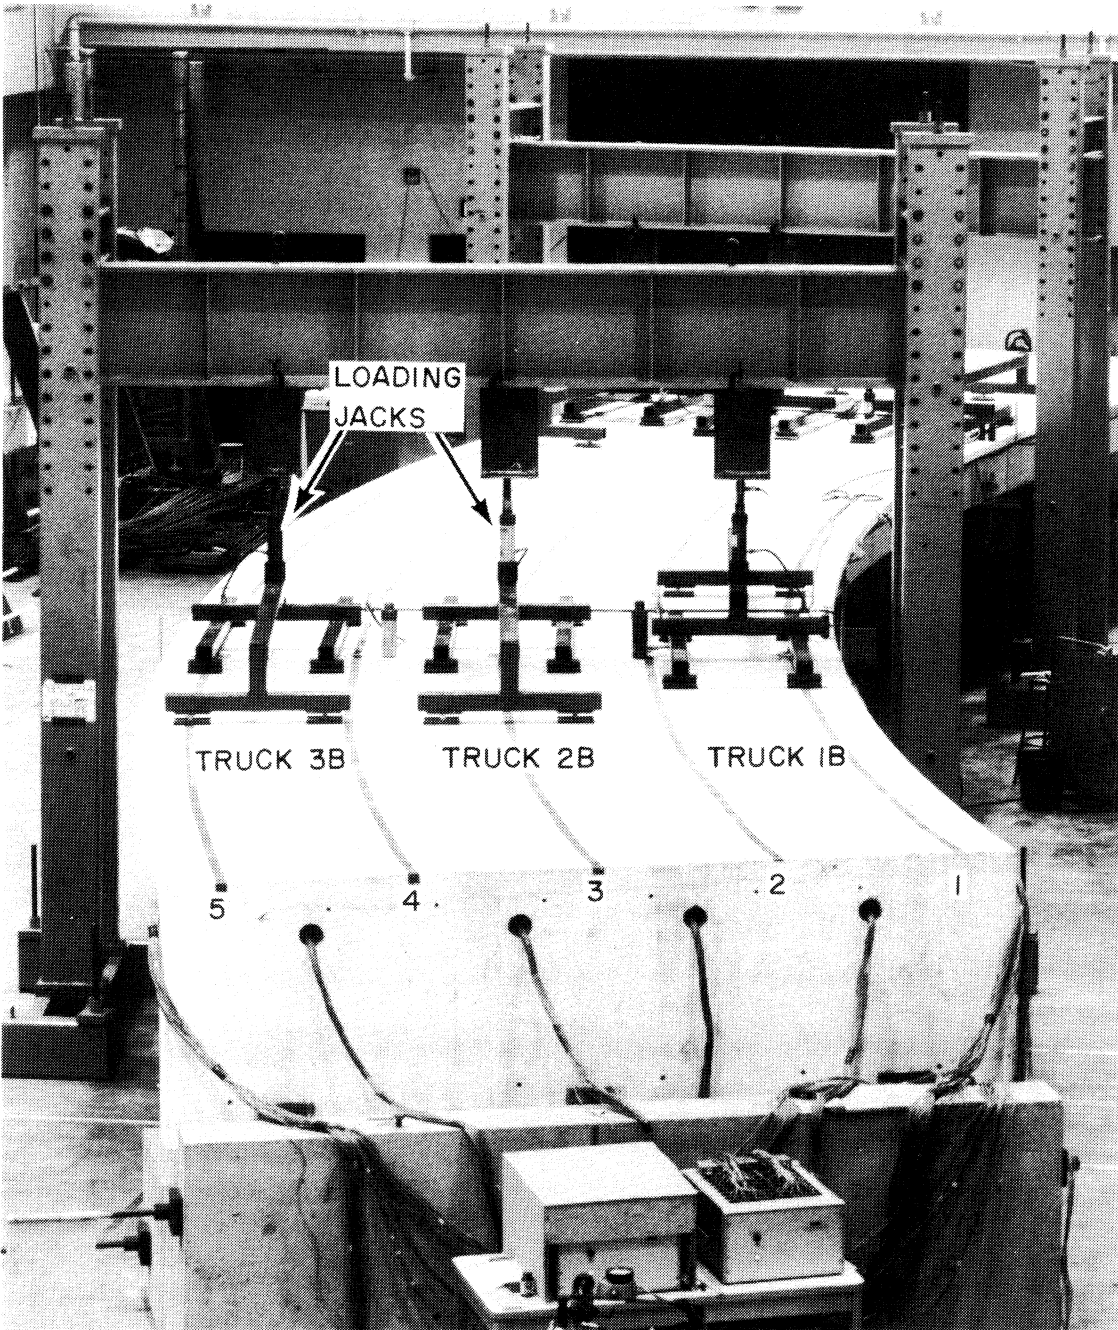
THREE LANE AASHTO TRUCK LOADING ON BRIDGE MODEL DECK
